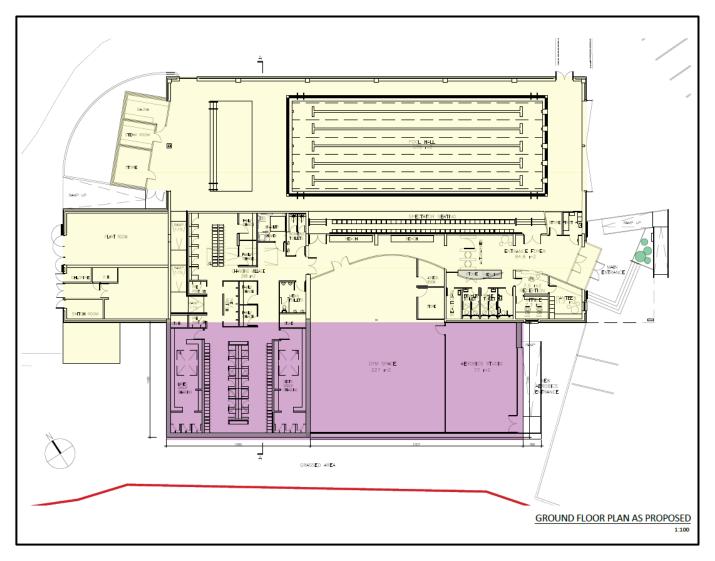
PROPOSED SITE LAYOUT (TOBIN CONSULTING ENGINEERS, 2024)
